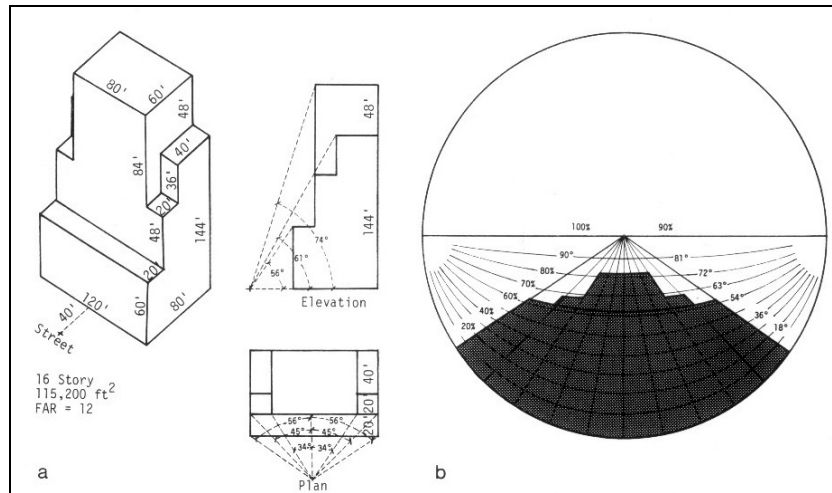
The Forming the Building to Daylight Conditions for Building with Setbacks
